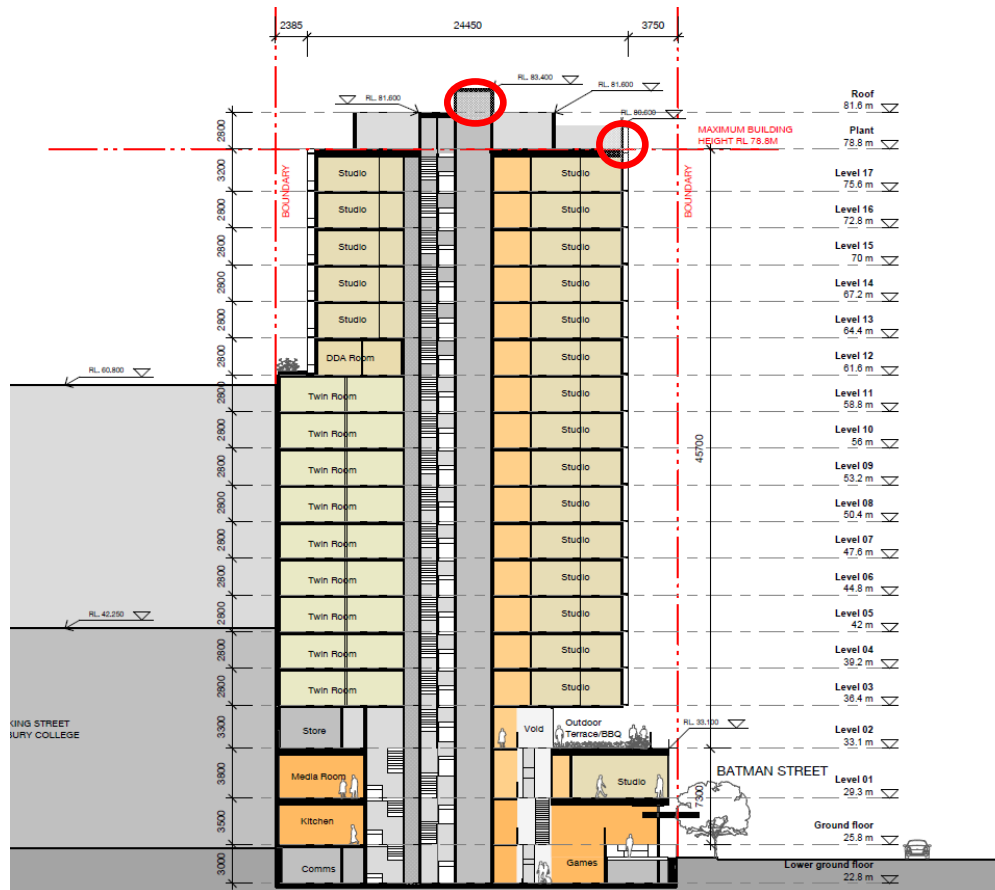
Proposed section plan. The red dashed horizontal line denotes the approved building height. The red circle denotes the parapet of the facade and the extents of the lift overrun which is proposed above the approved building height.
